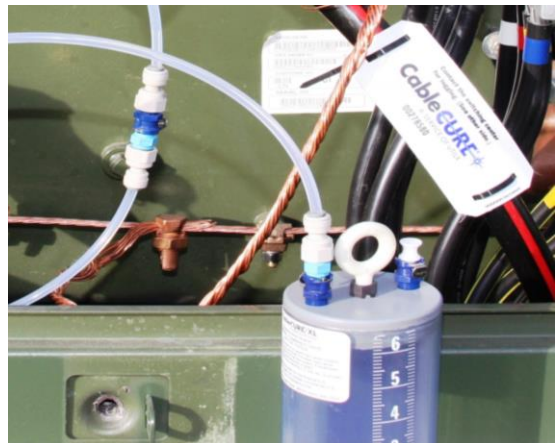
Install vacuum tank and check to ensure an adequate vacuum within the cable.
